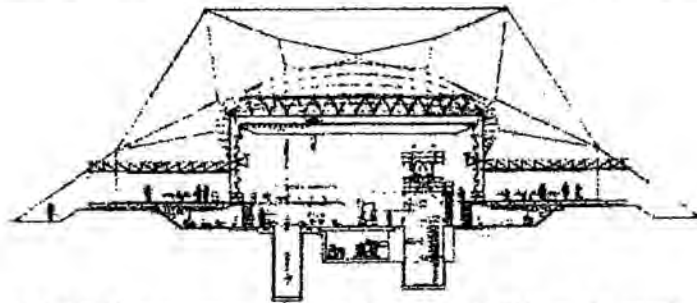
Transverse section through drilling rig station, labs and offices.
